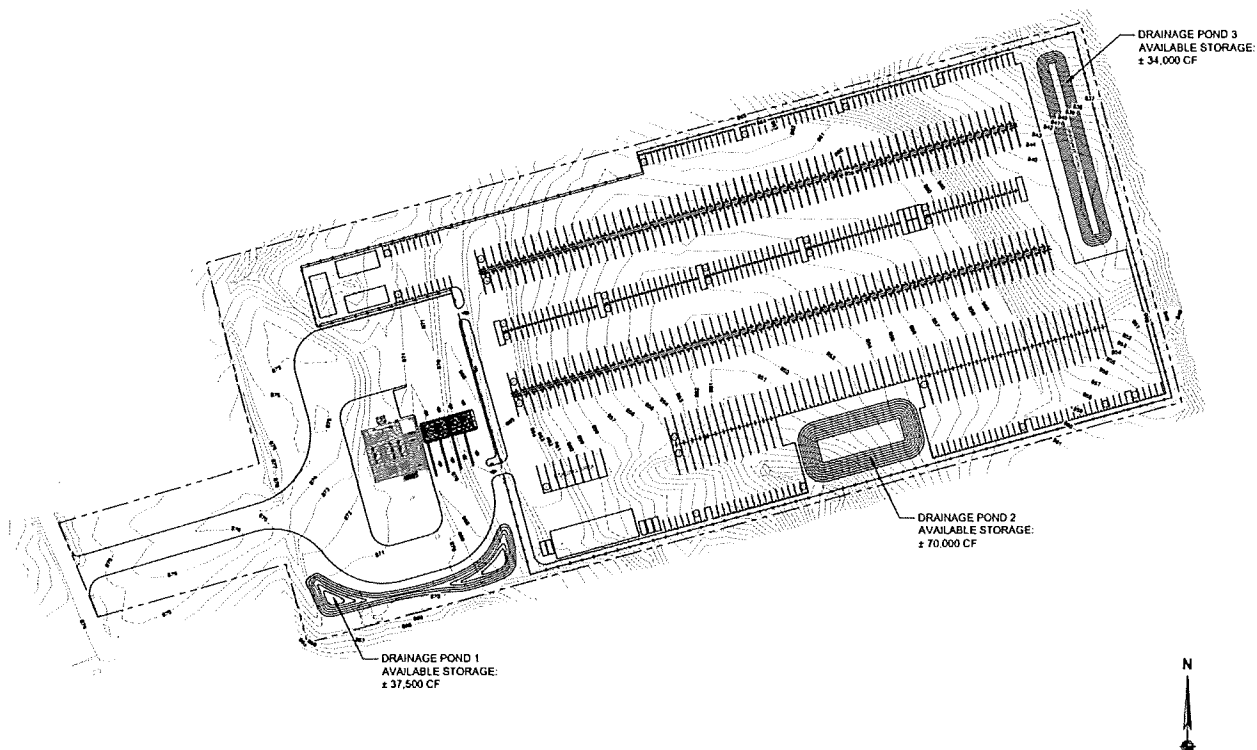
Proposed Preliminary CNG Development Site Plan. N.T.S.
